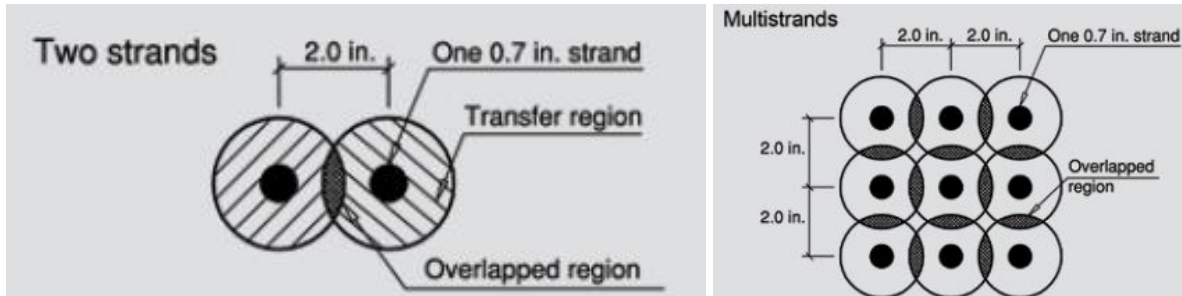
Overlapped stresses at strand spacings of 2 in. (Dang et al. 2016)
